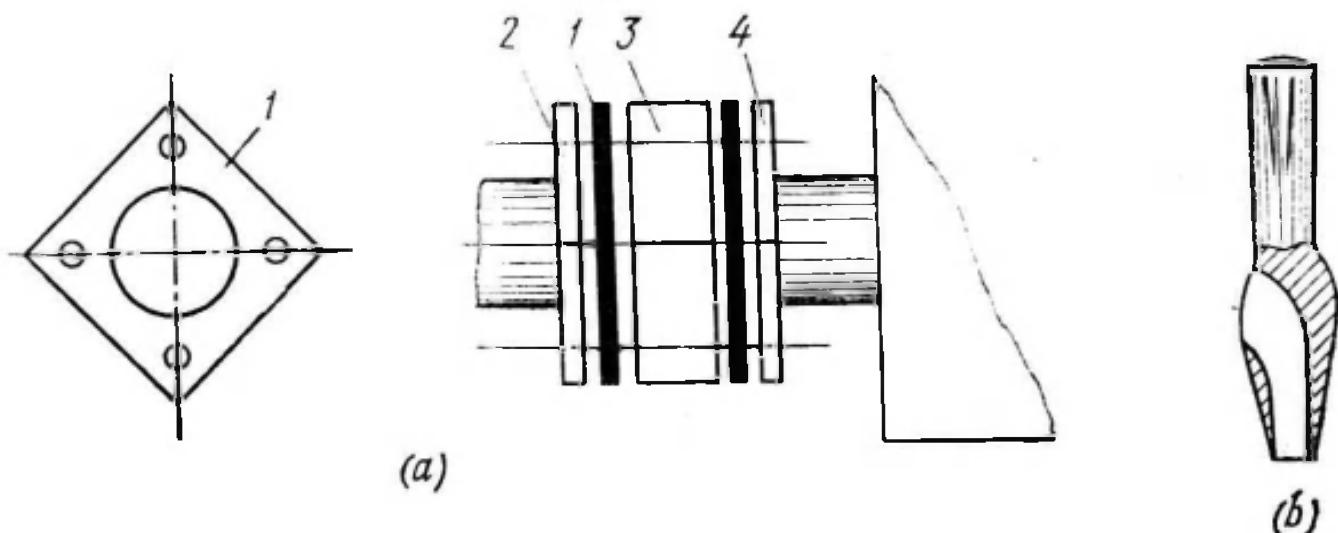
(a) Mounting of sealing gaskets on a radiator and (b) a steel hollow-punch
